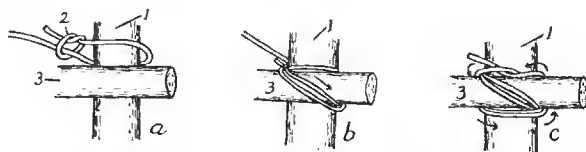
Lashing of the scaffolding: *a*, fixation of lashing; *b*, lashing in oblique turns around two wooden elements; *c*, final circumferential turn of strip around lashing between wooden elements; 1, oblique timber, fixed wooden element; 2, single overhand running noose or slip knot; 3, cross piece.
